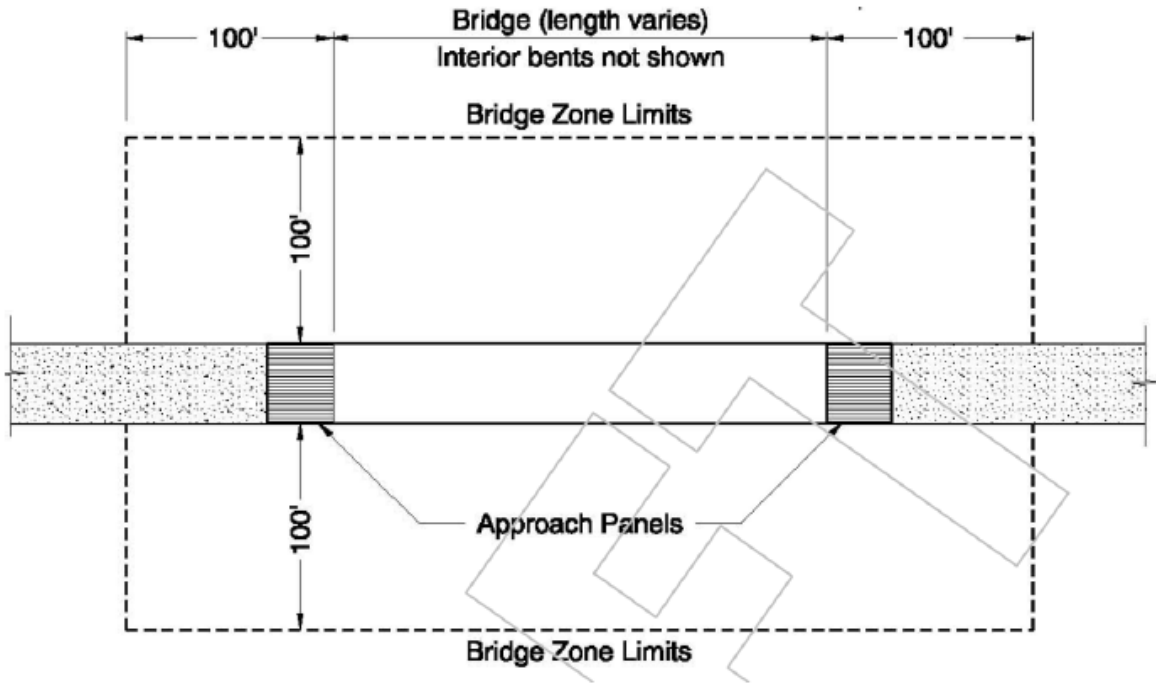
Bridge zone limits (from AK DOT & PF 2013)
